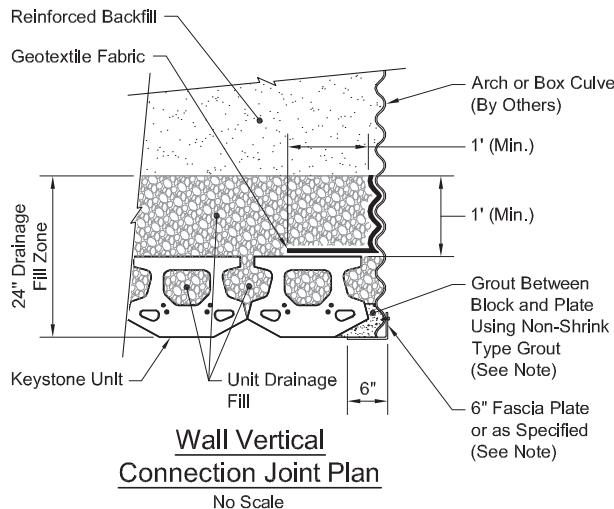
TYPICAL DRAINAGE STRUCTURE
